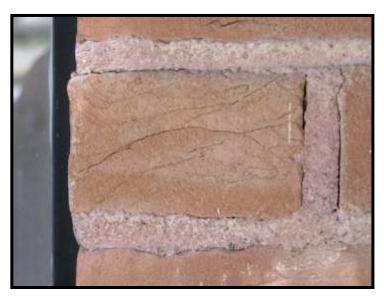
Dry pressed brick, end view. Cracks in brick are from hand placement of clay in the form. Brick probably laid with bottom up. Note red tinted mortar and stuck joints, vertical and horizontal.
